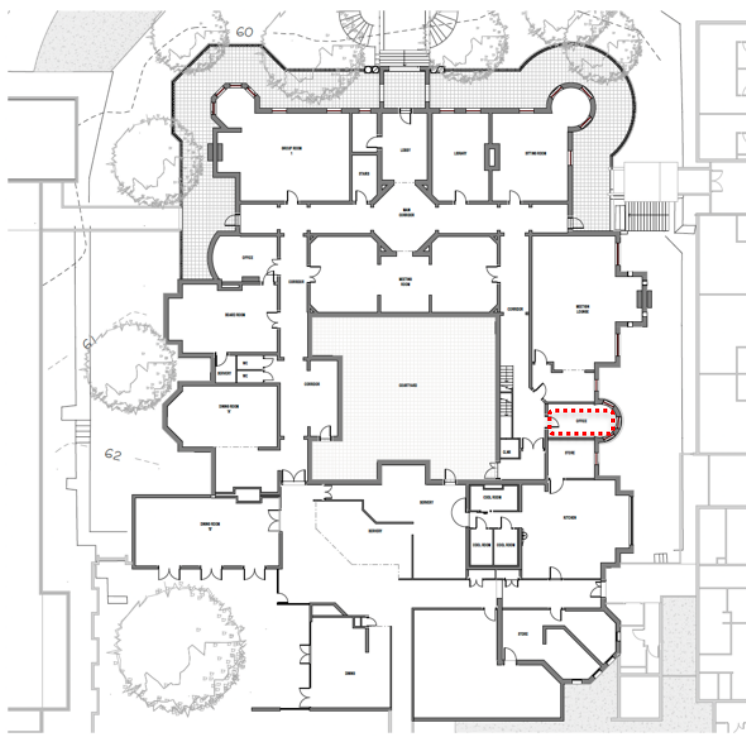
EXISTING GROUND FLOOR PLAN. Former Pantry outlined in red.
